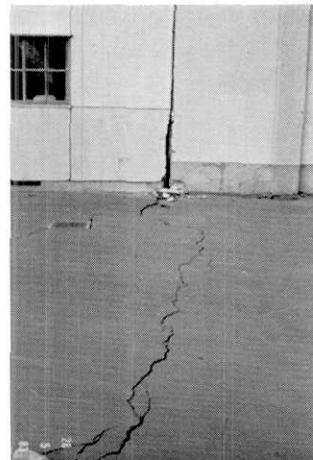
Damage to the expansion joint and ground cracks (Noshiro Shogyo High school).
